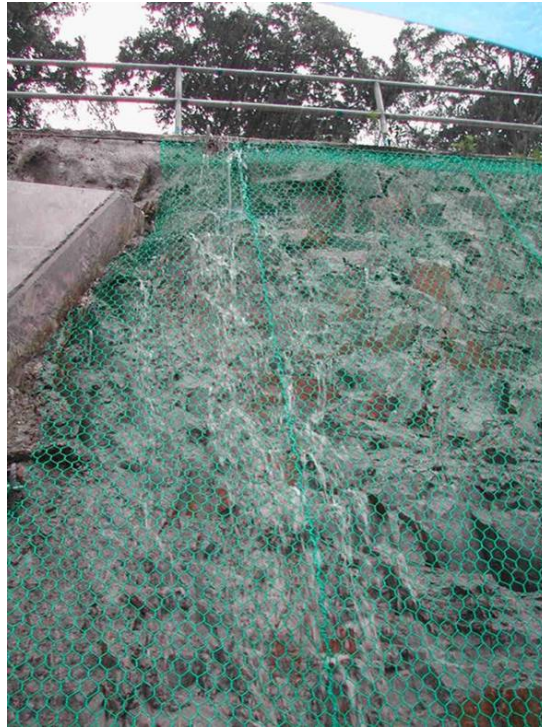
Water Over-topping the First Berm during a Rainstorm
